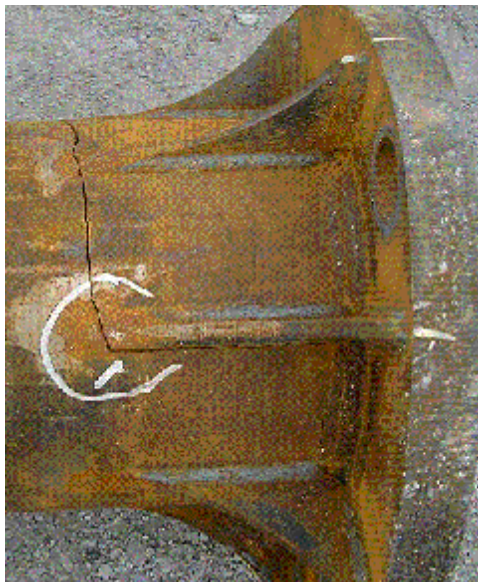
Valmont Gusset 3 & 4 specimens.
